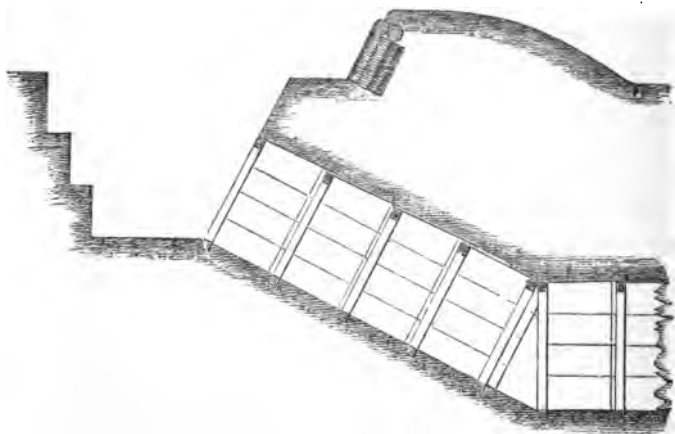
CHANGING FROM DESCENDING TO HORIZONTAL DIRECTION.
